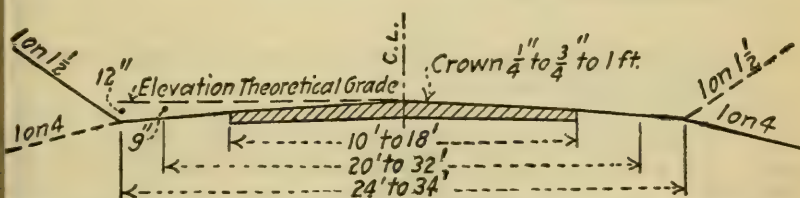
Typical minimum depth ditch section. (Traffic less than 5000 daily.)
